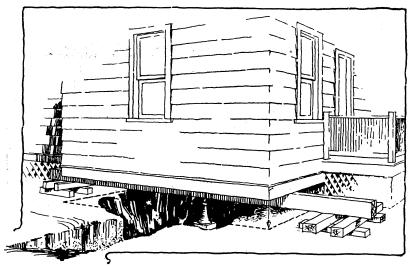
Method of supporting house on timbers and jack during excavation of cellar.
